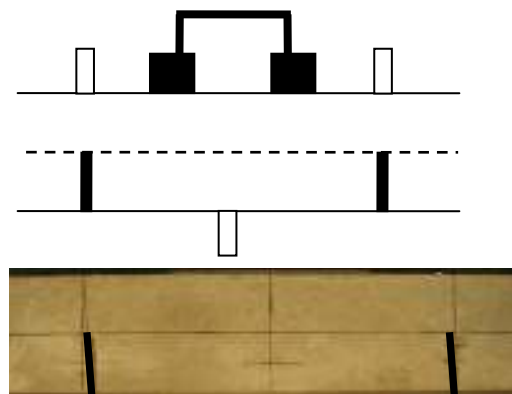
Damage Case D2 (Cutting of the beam up to N.A 100 mm with bottom bar intact)
